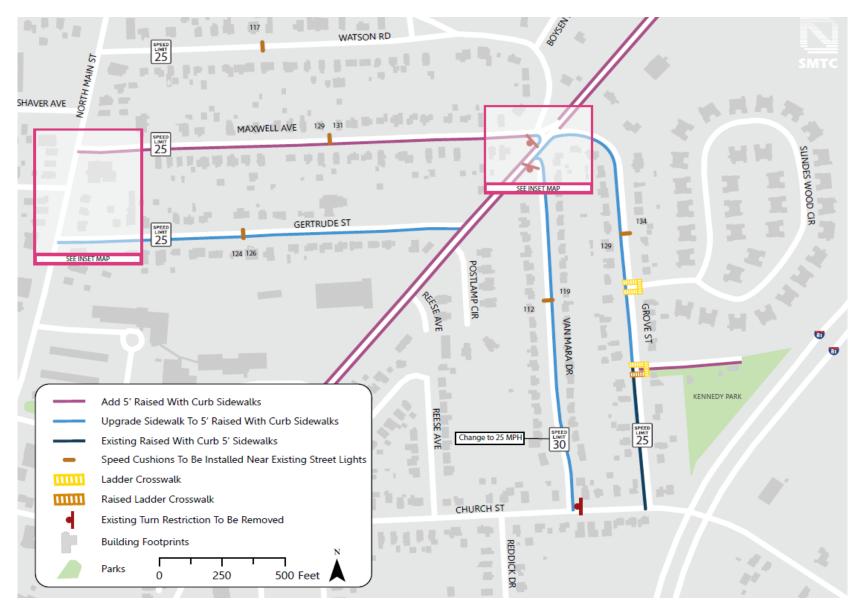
Proposed Sidewalk, Speed Cushion & Crosswalk Locations
